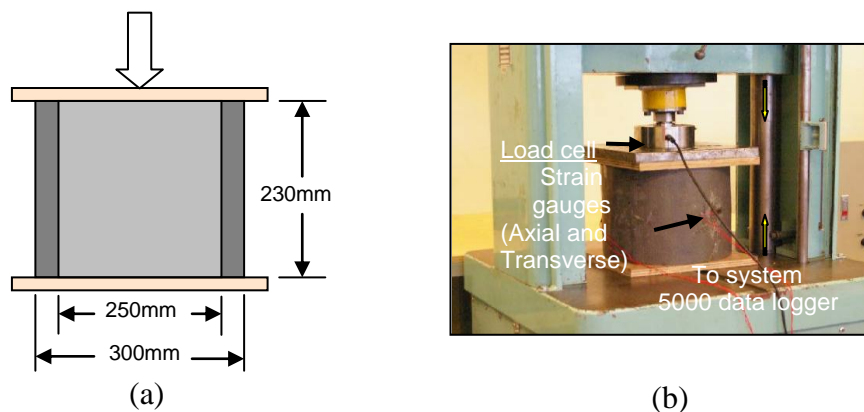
Compression test setup arrangements for 300 mm external diameter pile
